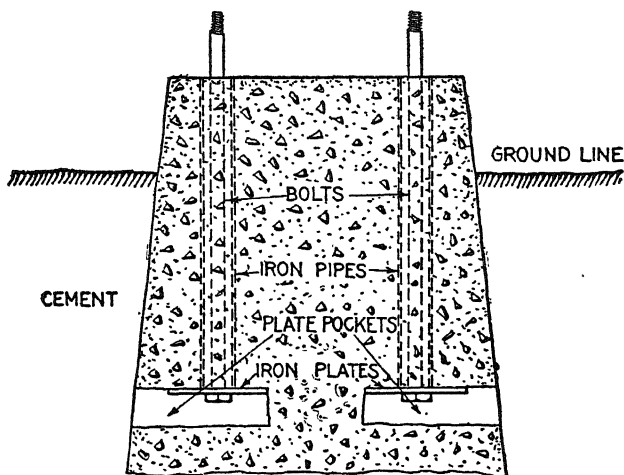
,236.—Concrete foundation, showing method of installing the anchor bolts.
